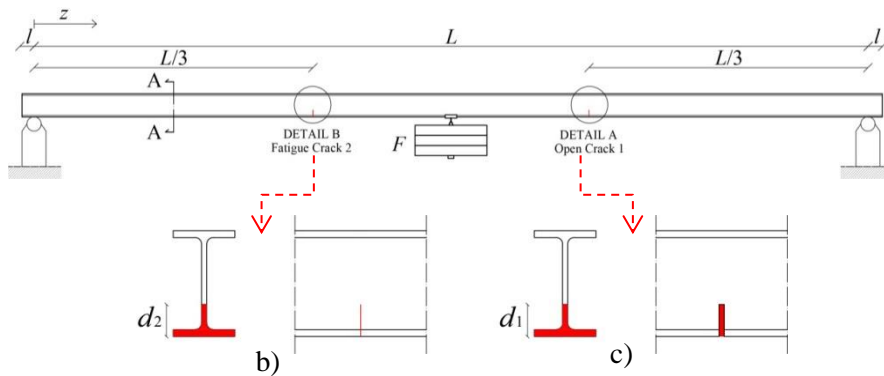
a) Double cracked beam; b) second fatigue crack detail B for $d_2=0.3h$; c) first open crack detail A for $d_1=0.25h$.
